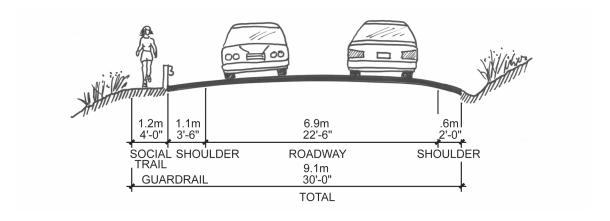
Existing Conditions at Lincoln Boulevard at Washington Boulevard
